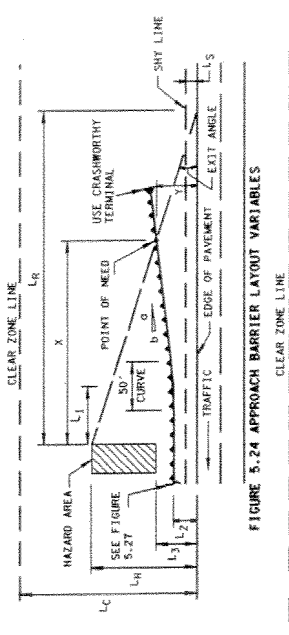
APPROACH BARRIER LAYOUT VARIABLES
